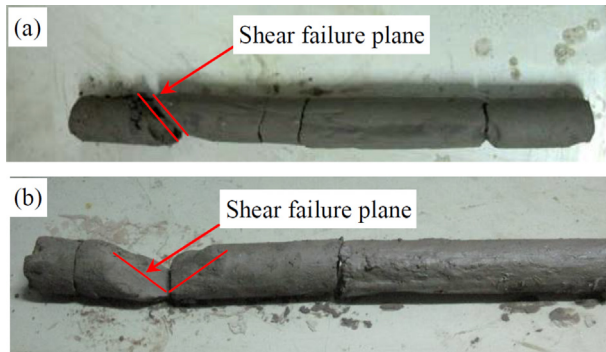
Photos of excavated columns: (a) failed column under rigid footing and (b) failed column under embankment fill.
